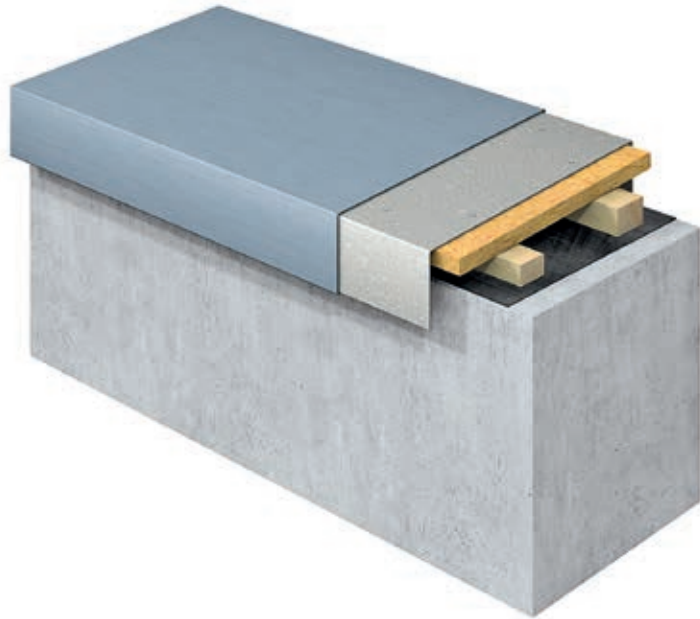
Wall coping – Fixing with continuous cleats made of galvanised steel
